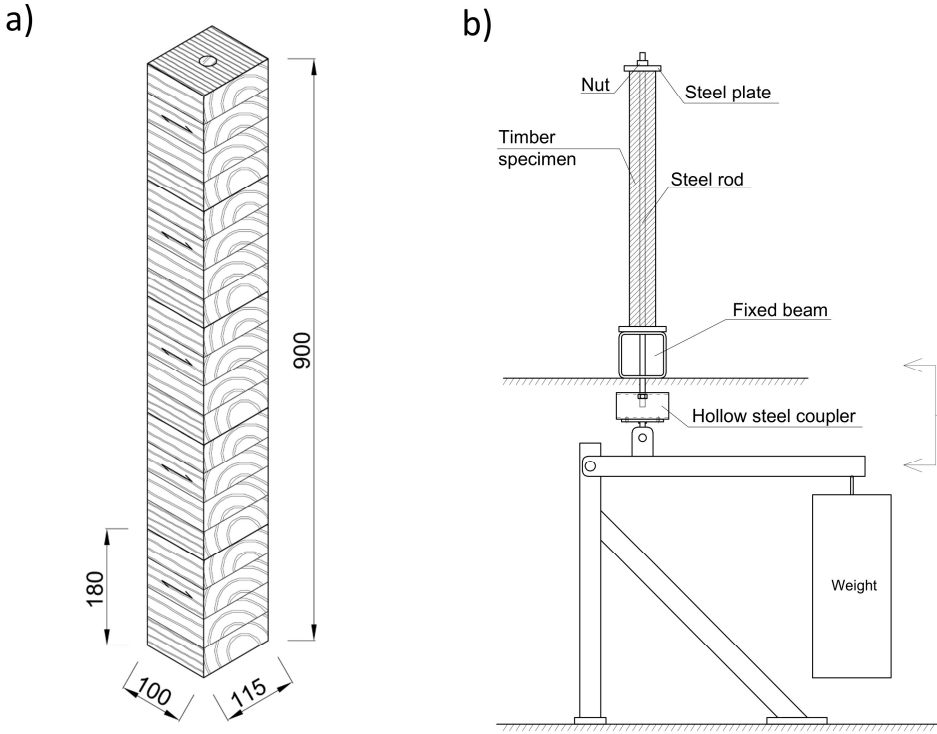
a) Sketch of a timber specimen (units in mm); b) lateral view of the test setup
